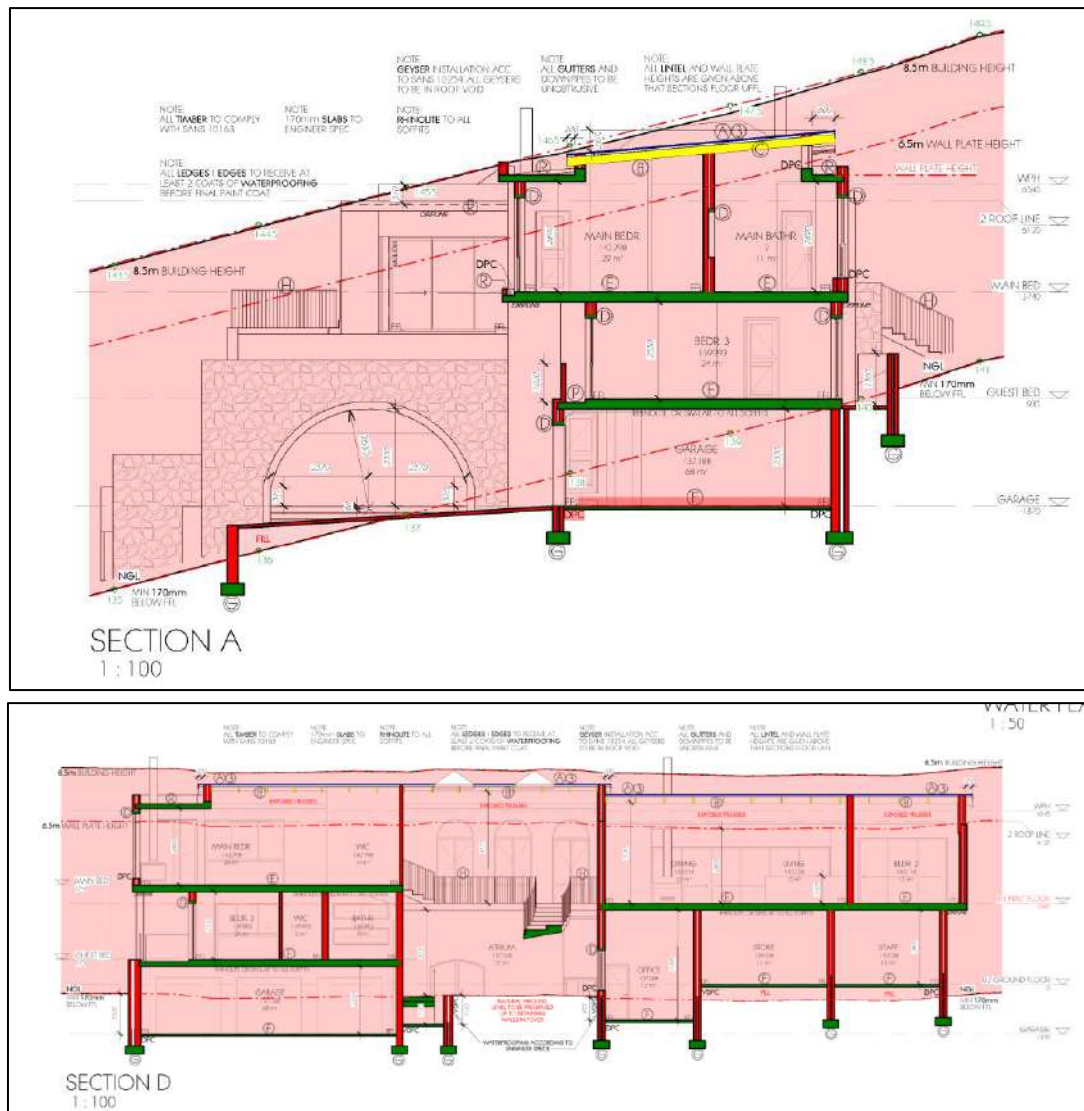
EXTRACT ARCHITECT PLANS - SECTIONS A & D
